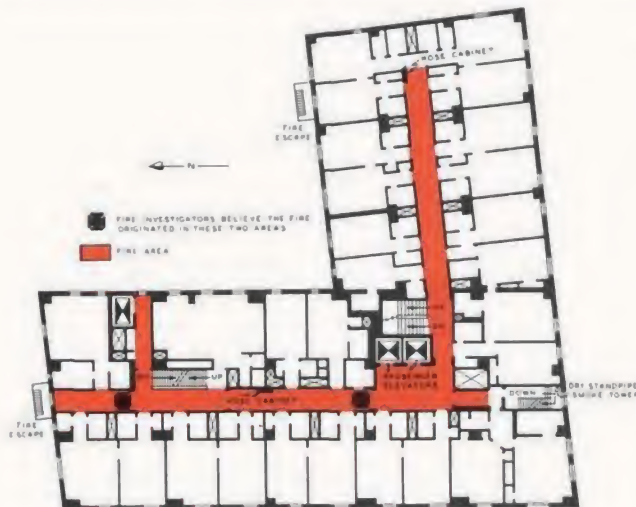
Floor plan of the fourth floor, which is typical of the third through sixth stories. The shading indicates the area on the fourth floor destroyed by fire.
